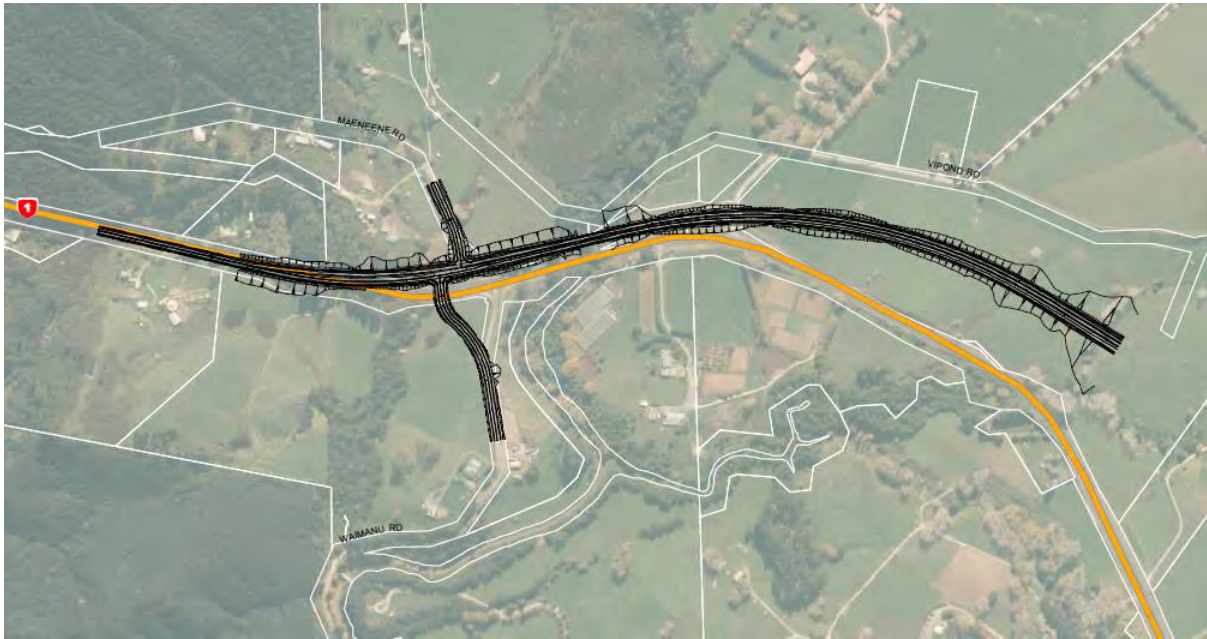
New offline bridge and upgrade to at-grade intersection (JG01)
